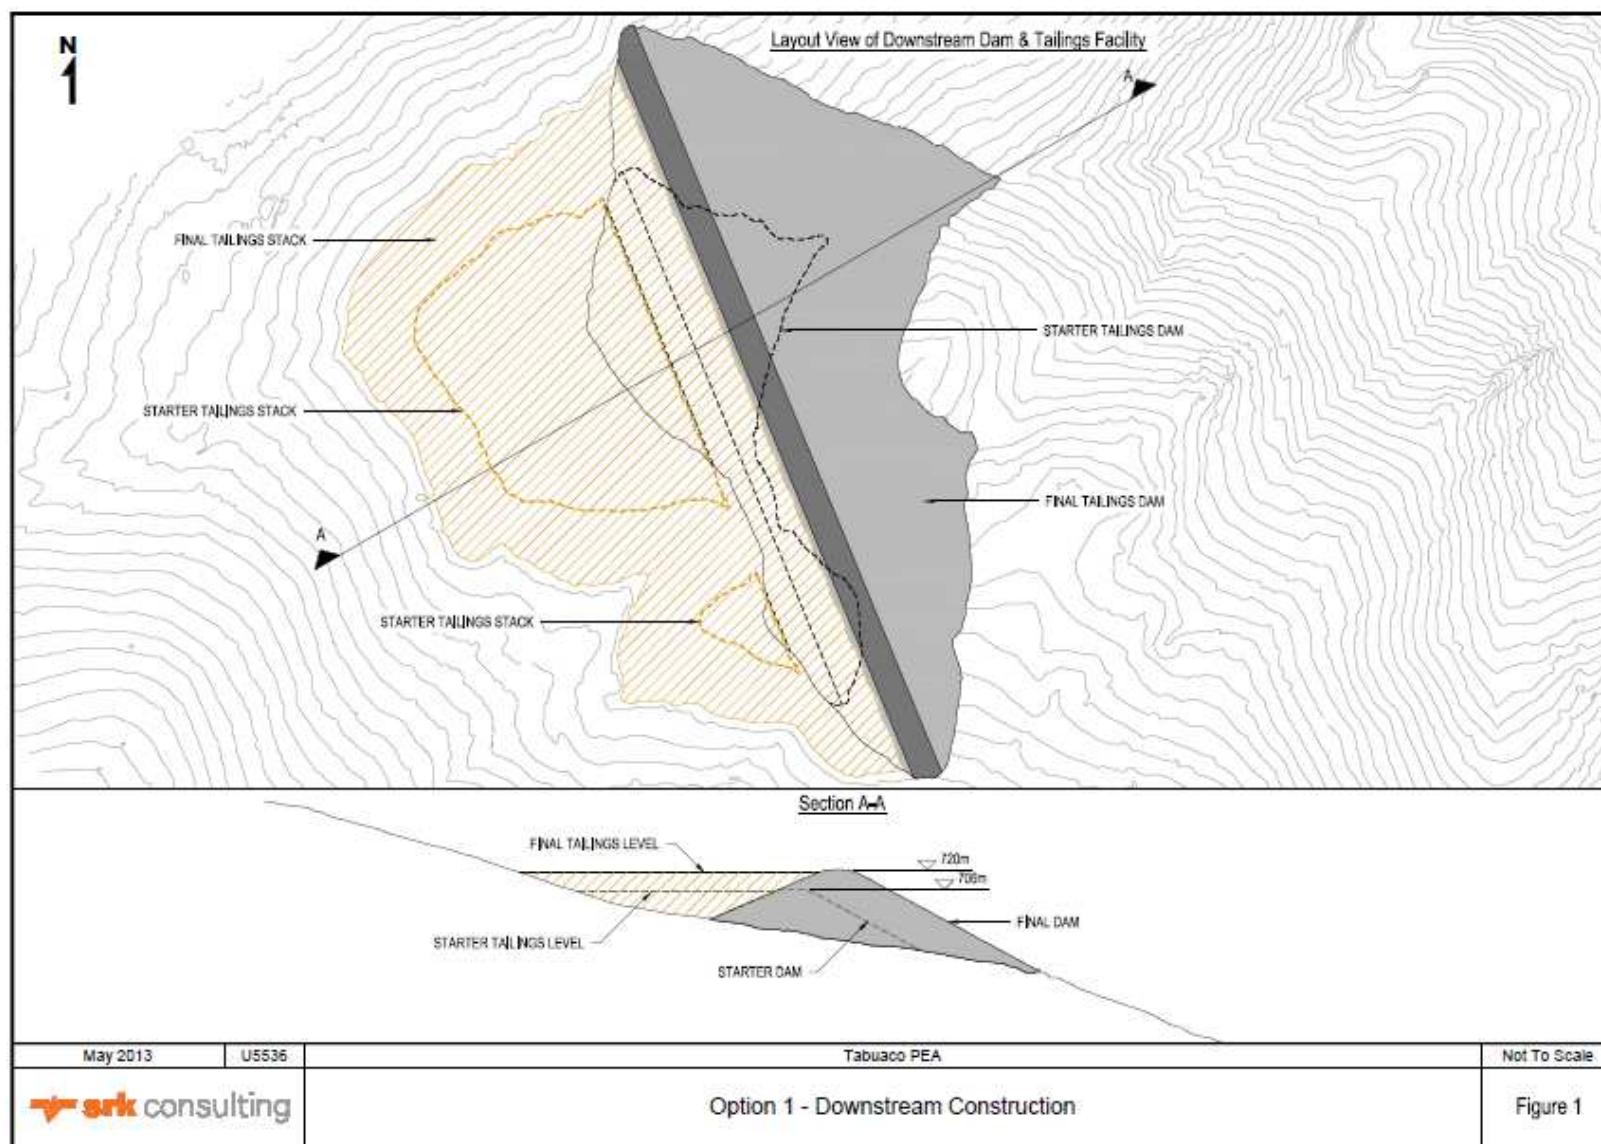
Wet Tailings Embankment Layout and Cross Section
